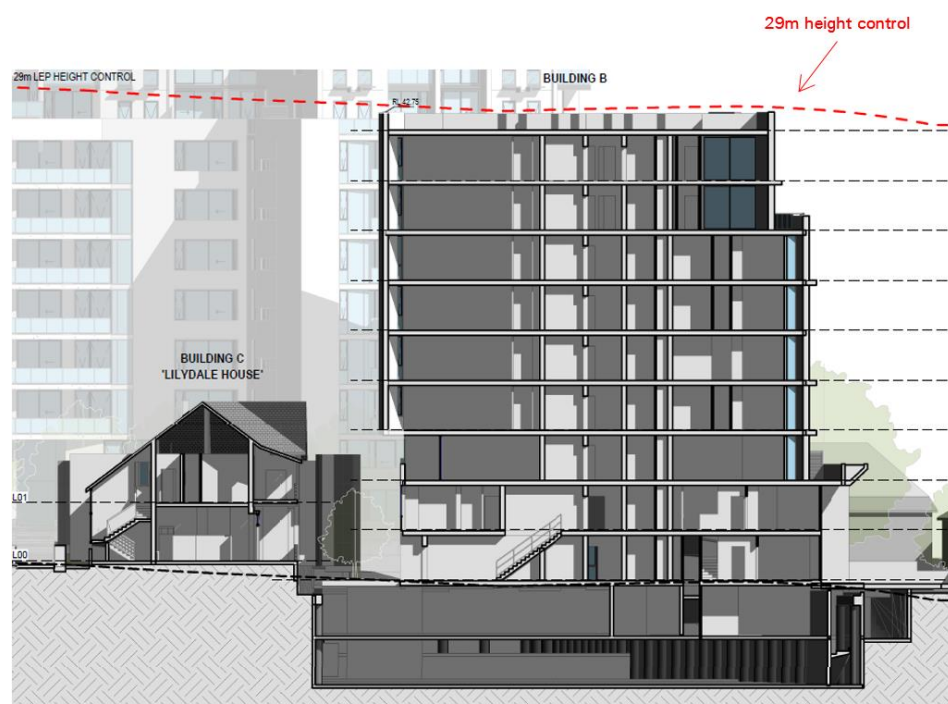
Building B maximum height. The above demonstrates that proposed Building B complies with the 29 metre height control
